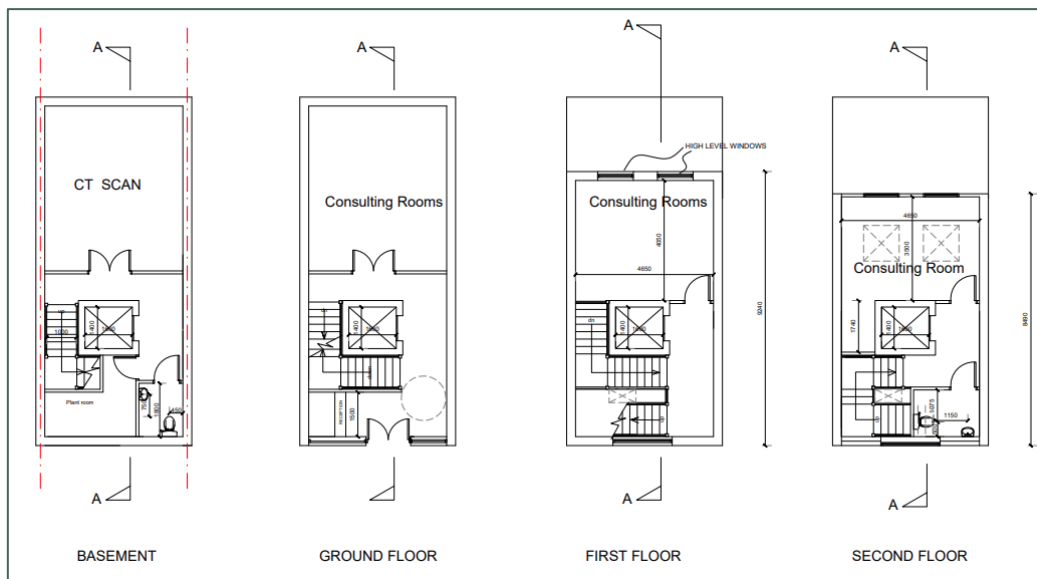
Proposed floor plans (The Gillett Macleod Partnership)
